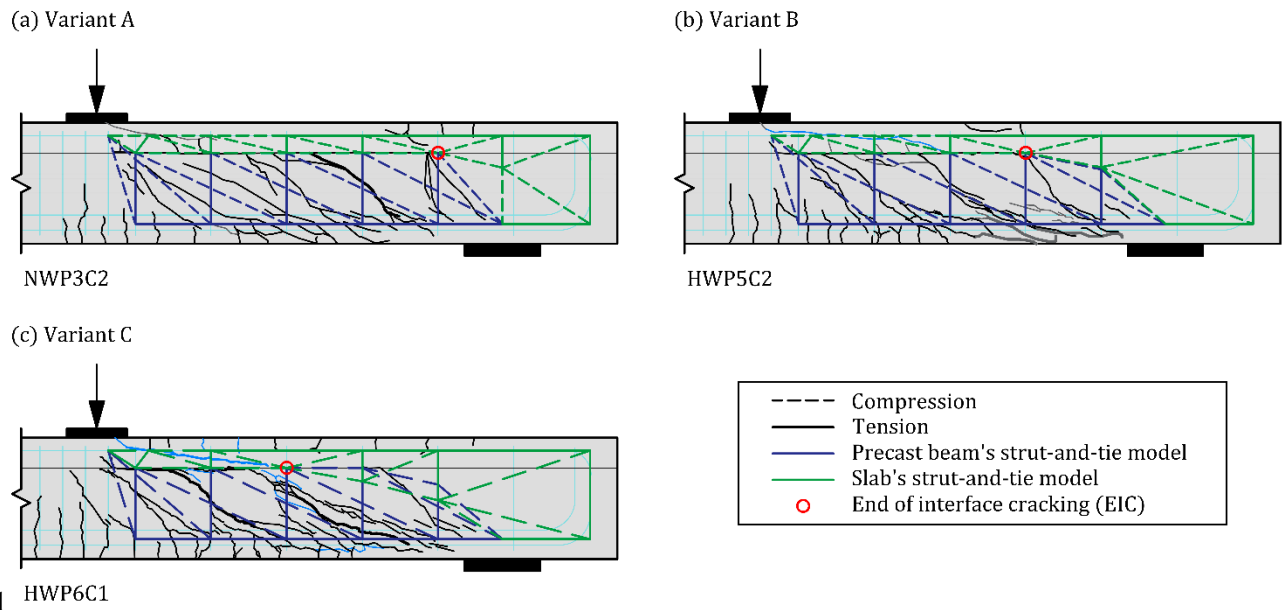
Strut-and-tie model for the precast beam and the cast-in-place slab proposed in [24]: (a) Variant A (specimen NWP3C2); (b) Variant B (specimen HWP5C2); (c) Variant C (specimen HWP6C1).
